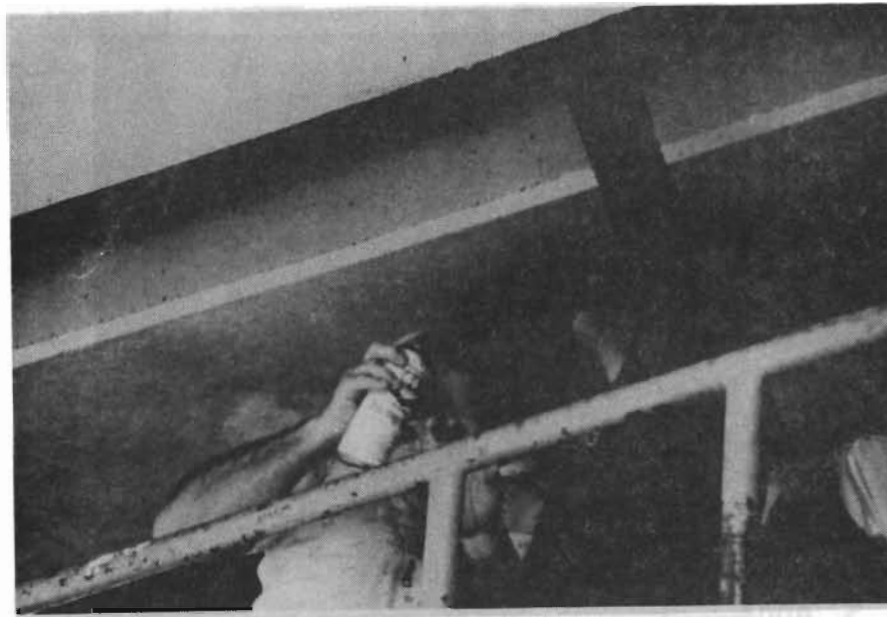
Detailed inspection of girders for any indication of cracking
